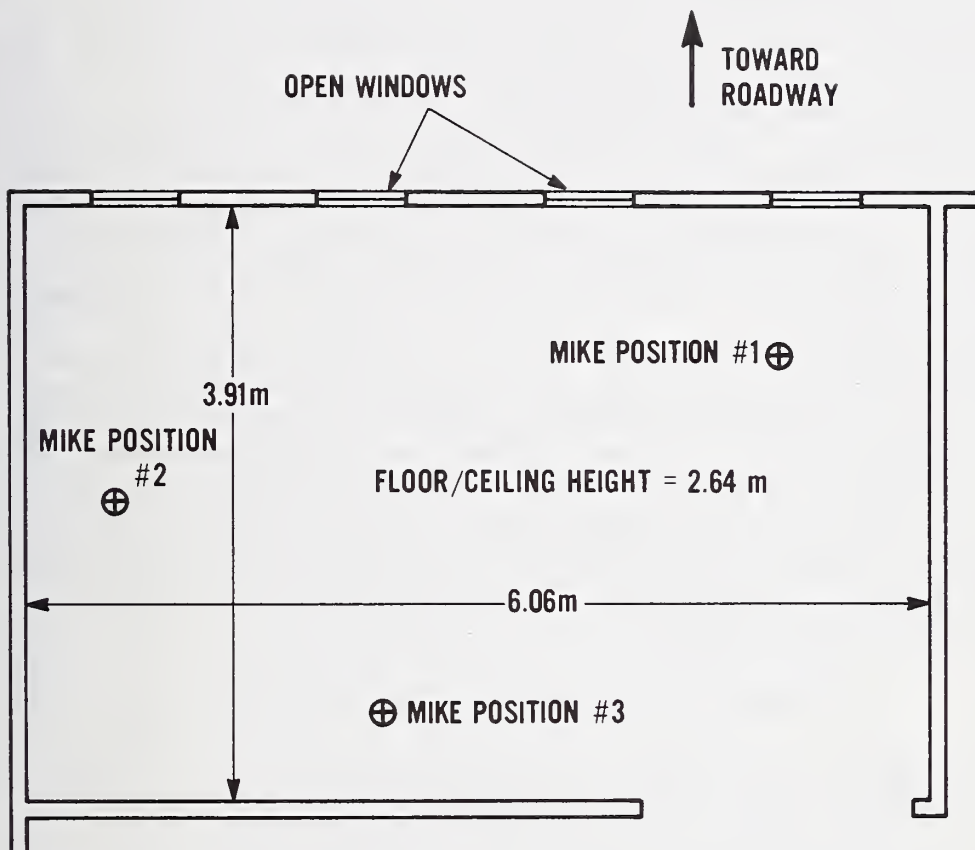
Floor plan and listener position microphone locations for Test House No. 2.
